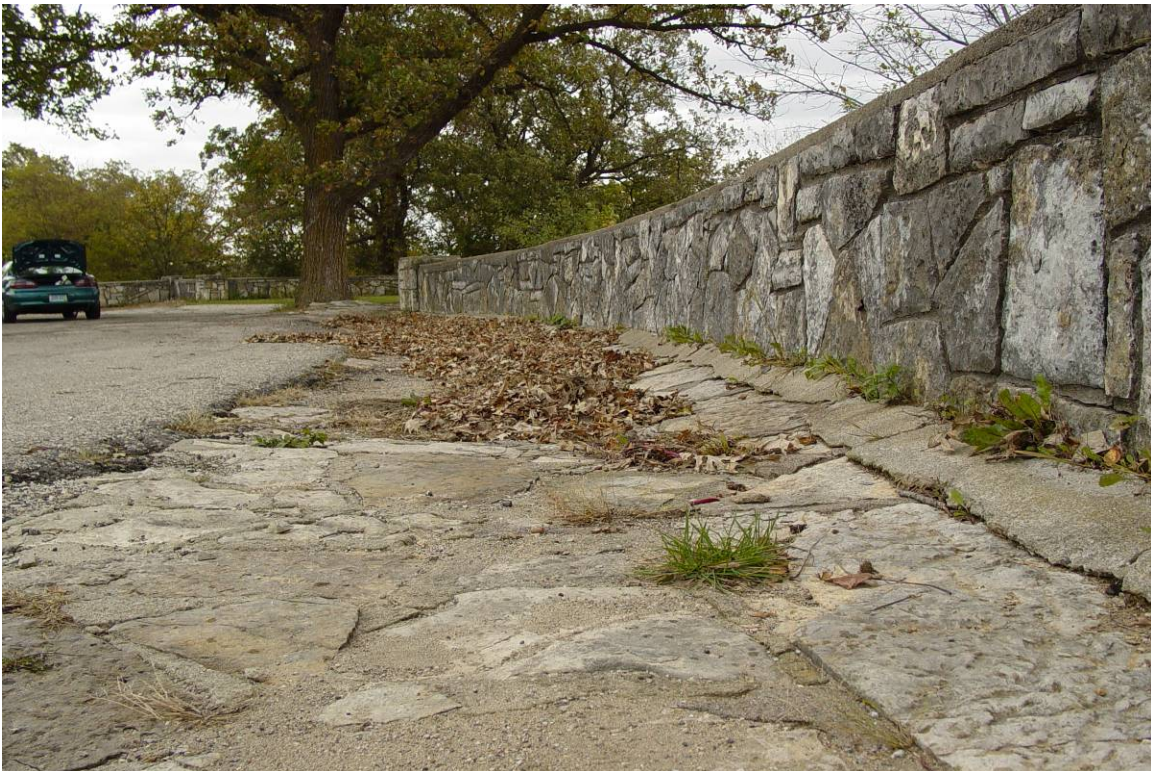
Flagstone terrace adjacent to central portion of overlook wall, facing west
